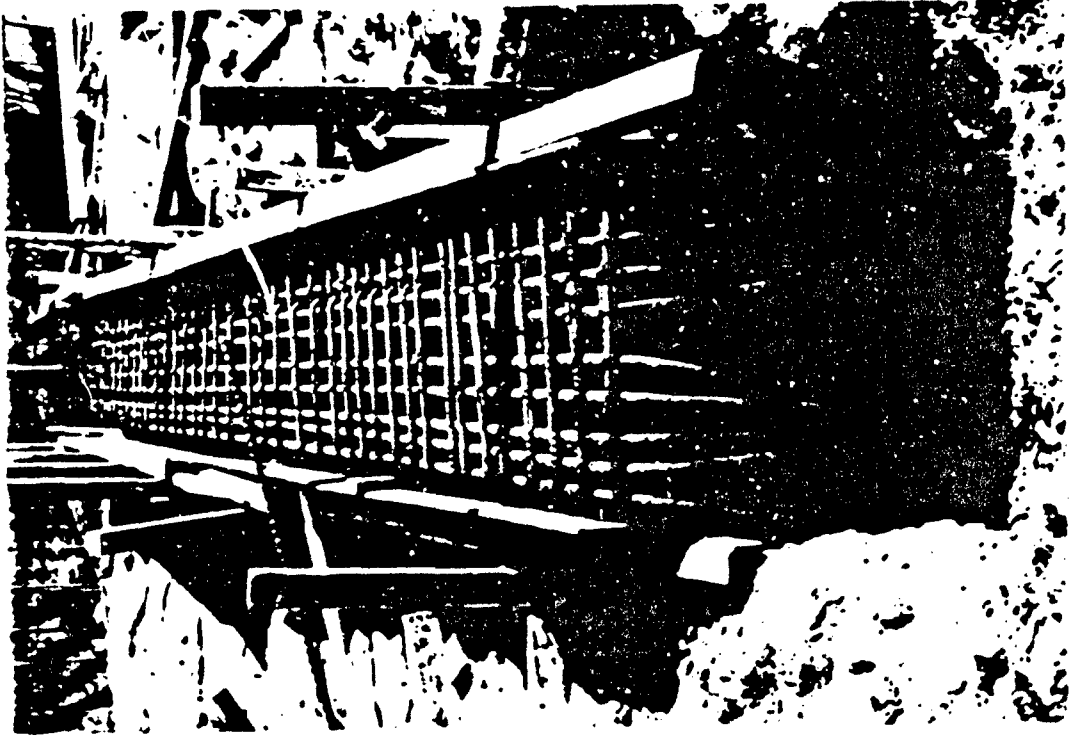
Hospital Construction -- Beam Reinforcing Steel
